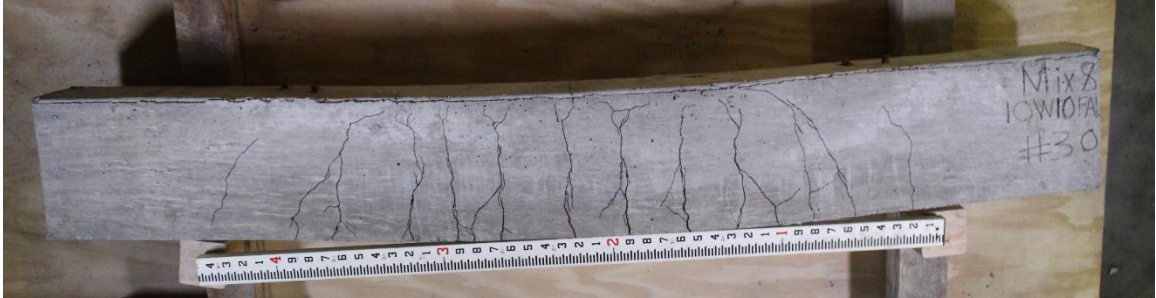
Mixture 8 (10W10FA1) beam #30: concrete beam side view.
